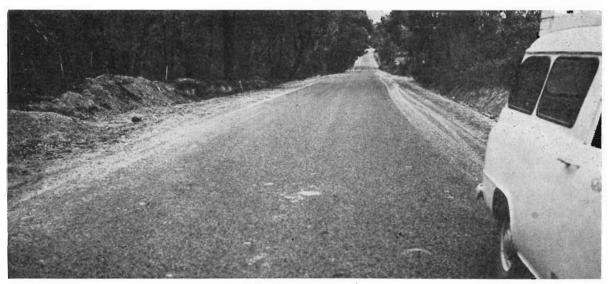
Woorayl Shire. Buffalo-Fish Creek Road. Reconstructed and sealed section near Buffalo.
